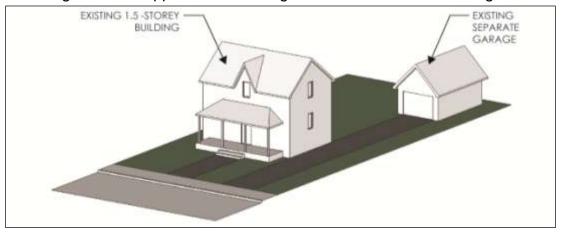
Typical existing massing for a 1.5-storey building on a contributing property
